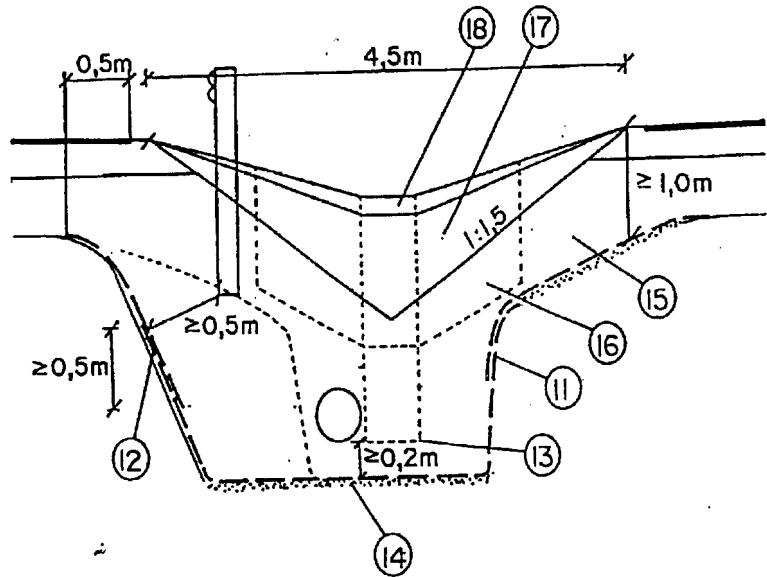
Central drainage ditch of highways. Guideline for slope protection.*)
